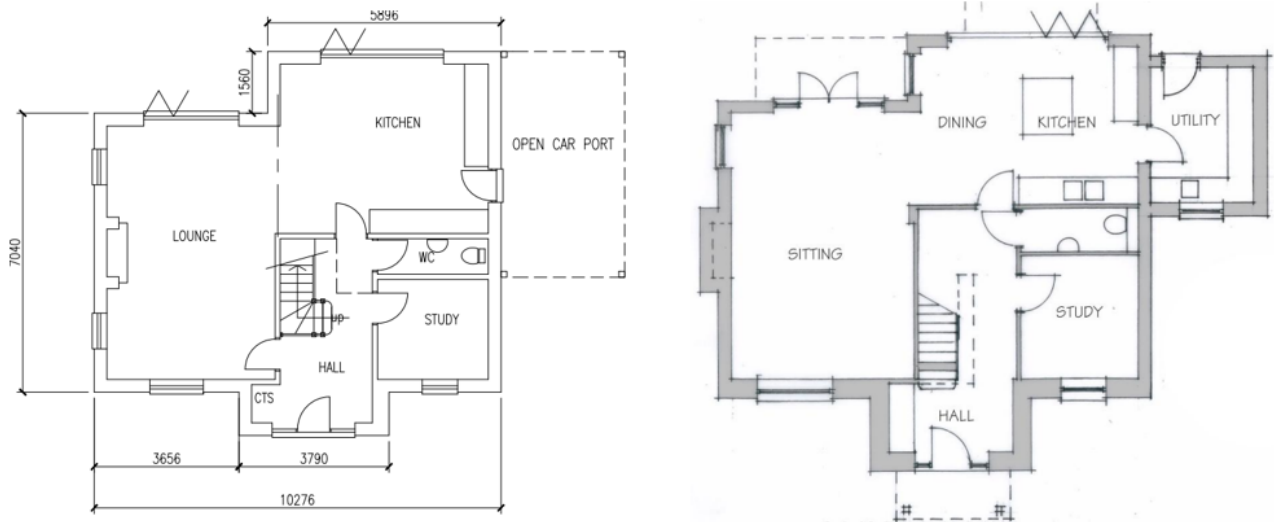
Approved (20/0358) GF Plan and Proposed (24/1007) GF Plan
